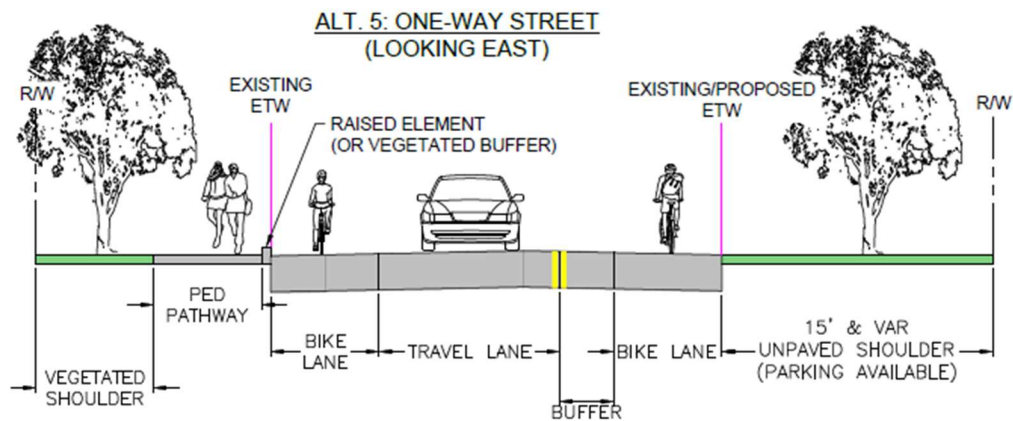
Coleman Avenue (Menlo Oaks) Alternative 5
